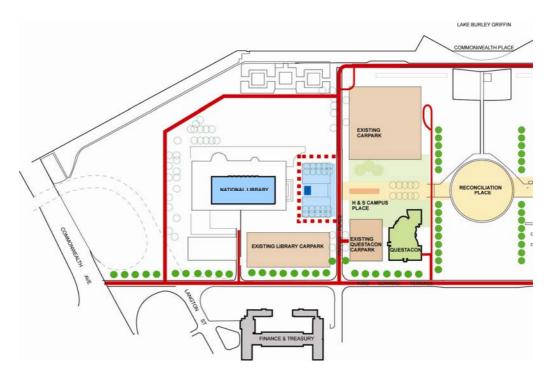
Master Plan Stage 2 (External loop Road Only with Possibility for Potential Developments)
